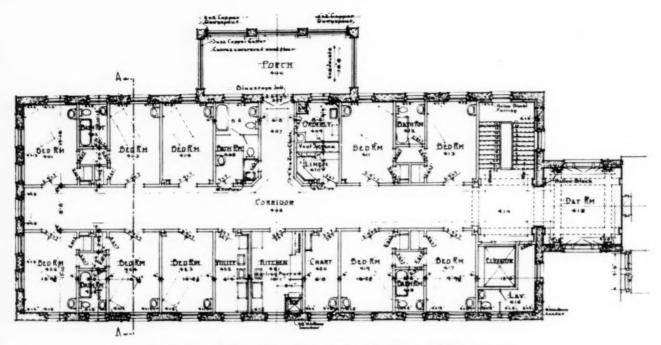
James Buchanan Brady Urological Institute-Fourth and fifth story plan.
